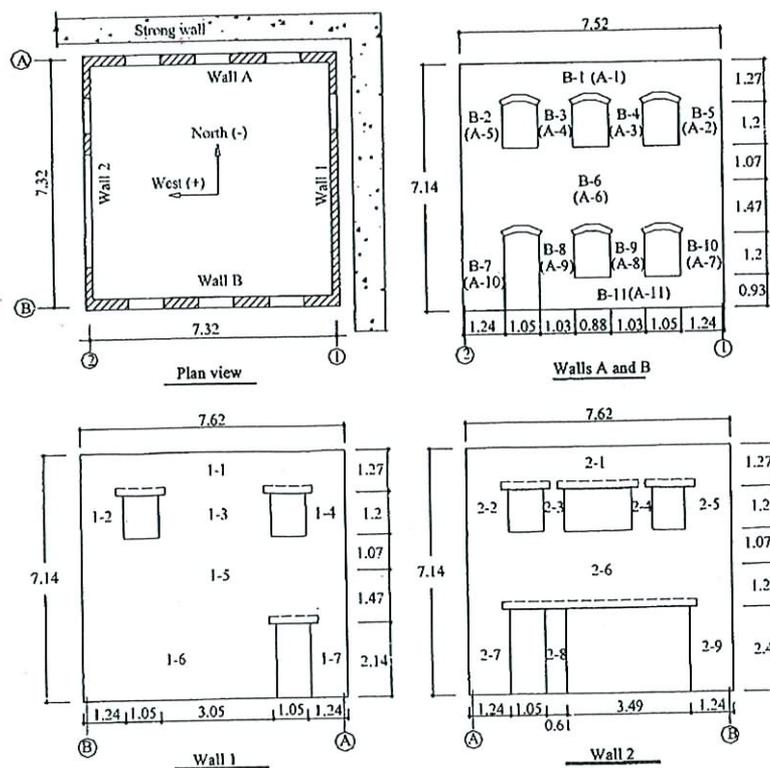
Plan view and elevation of test structure (dimensions in meter)
